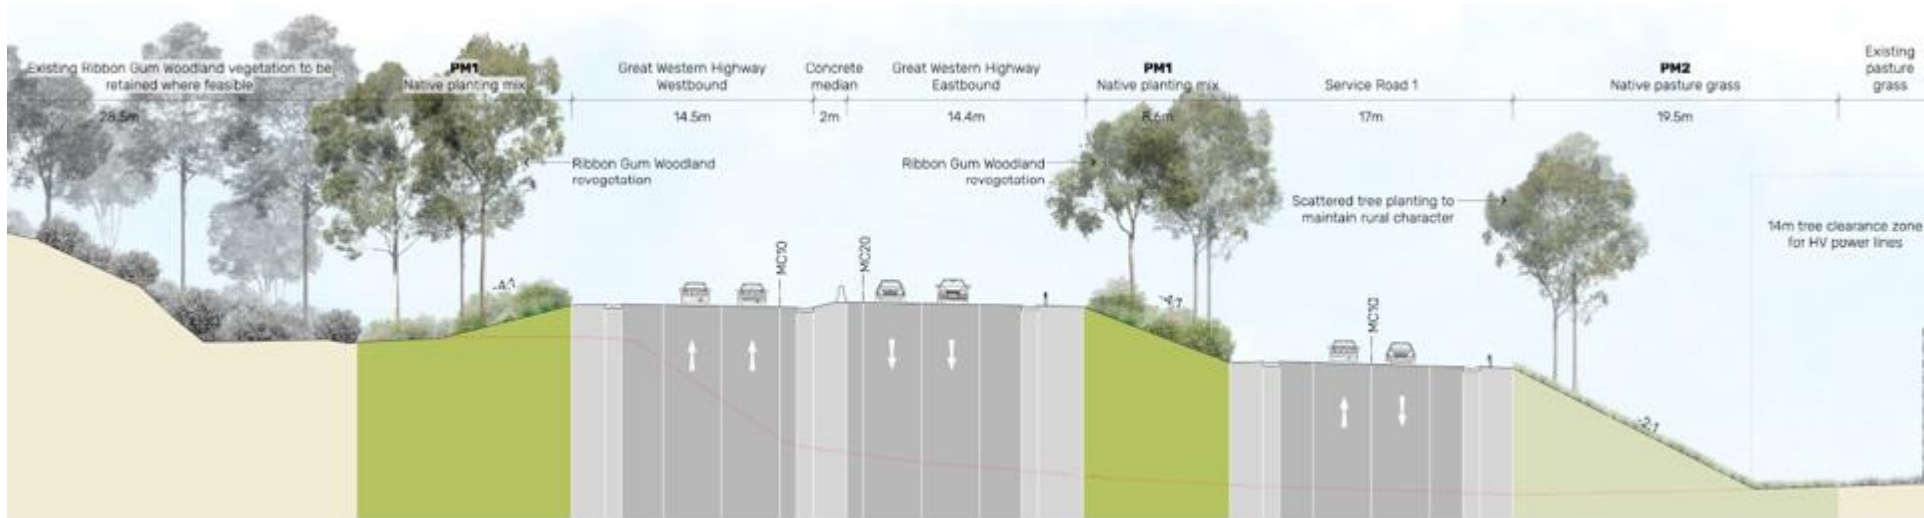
a Typical cross section of the Great Western Highway near Service Road 1
